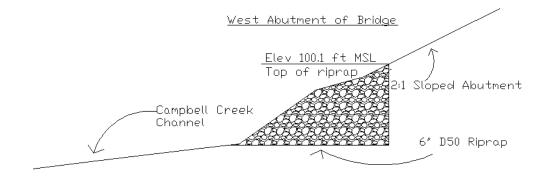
Typical Cross-Section of Bridge Riprap (West Side)
